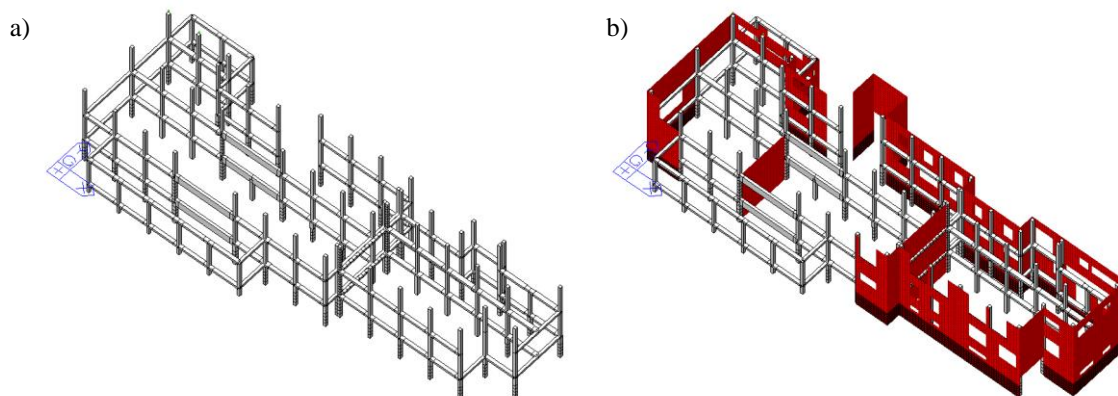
Numerical model of the actual structure (a) and retrofitted structure (b)
